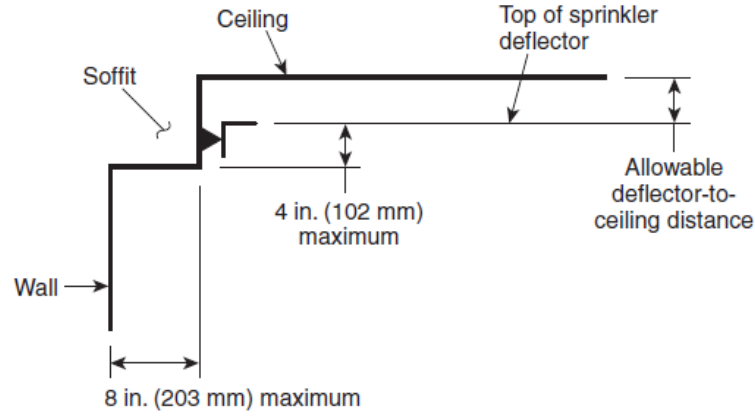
Location Sidewalls with Respect to Soffits — Sidewall in Soffit.
